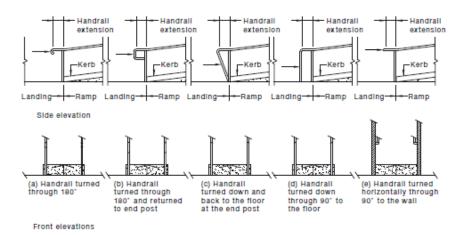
(A) RAMP HANDRAILS—EXAMPLES OF HANDRAIL TERMINATIONS
